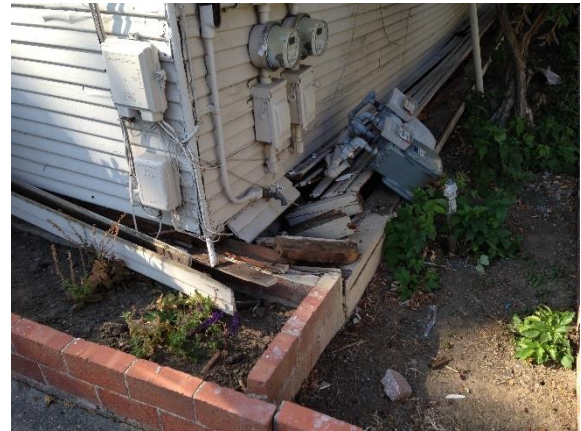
One-story single-family crawlspace house that came off of its foundation in the 2014 South Napa earthquake. The gas meter was damaged and the toppled porch roof blocked the front door creating an unsafe condition. (Photo credit: CEA)
